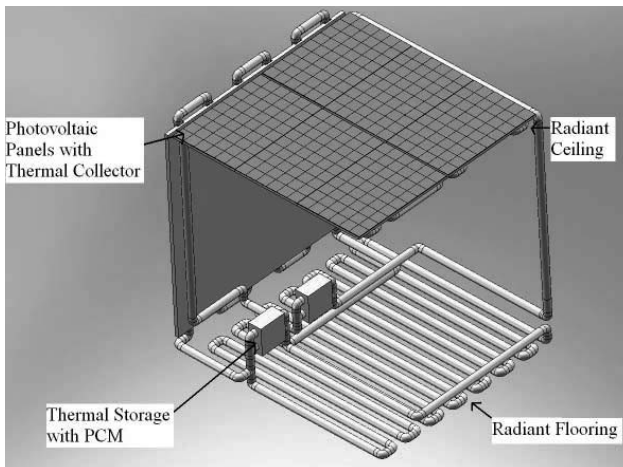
HVAC concept diagram, showing PCM storage, radiant ceiling/flooring and thermal collector.
